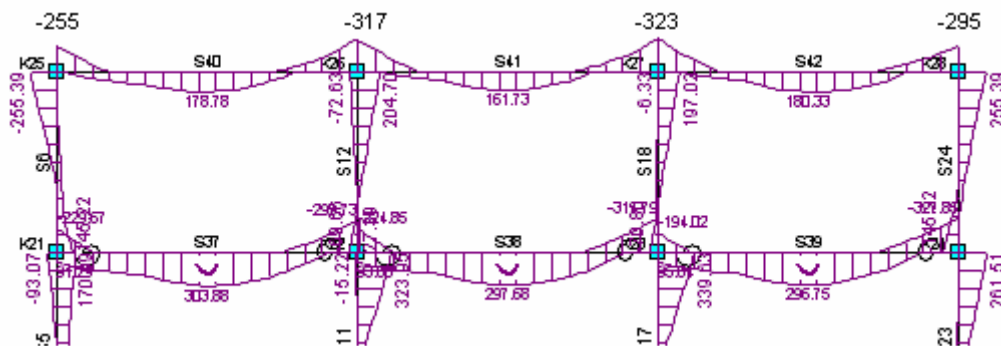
B.M. diagram after changing the roof beams dimensions.
